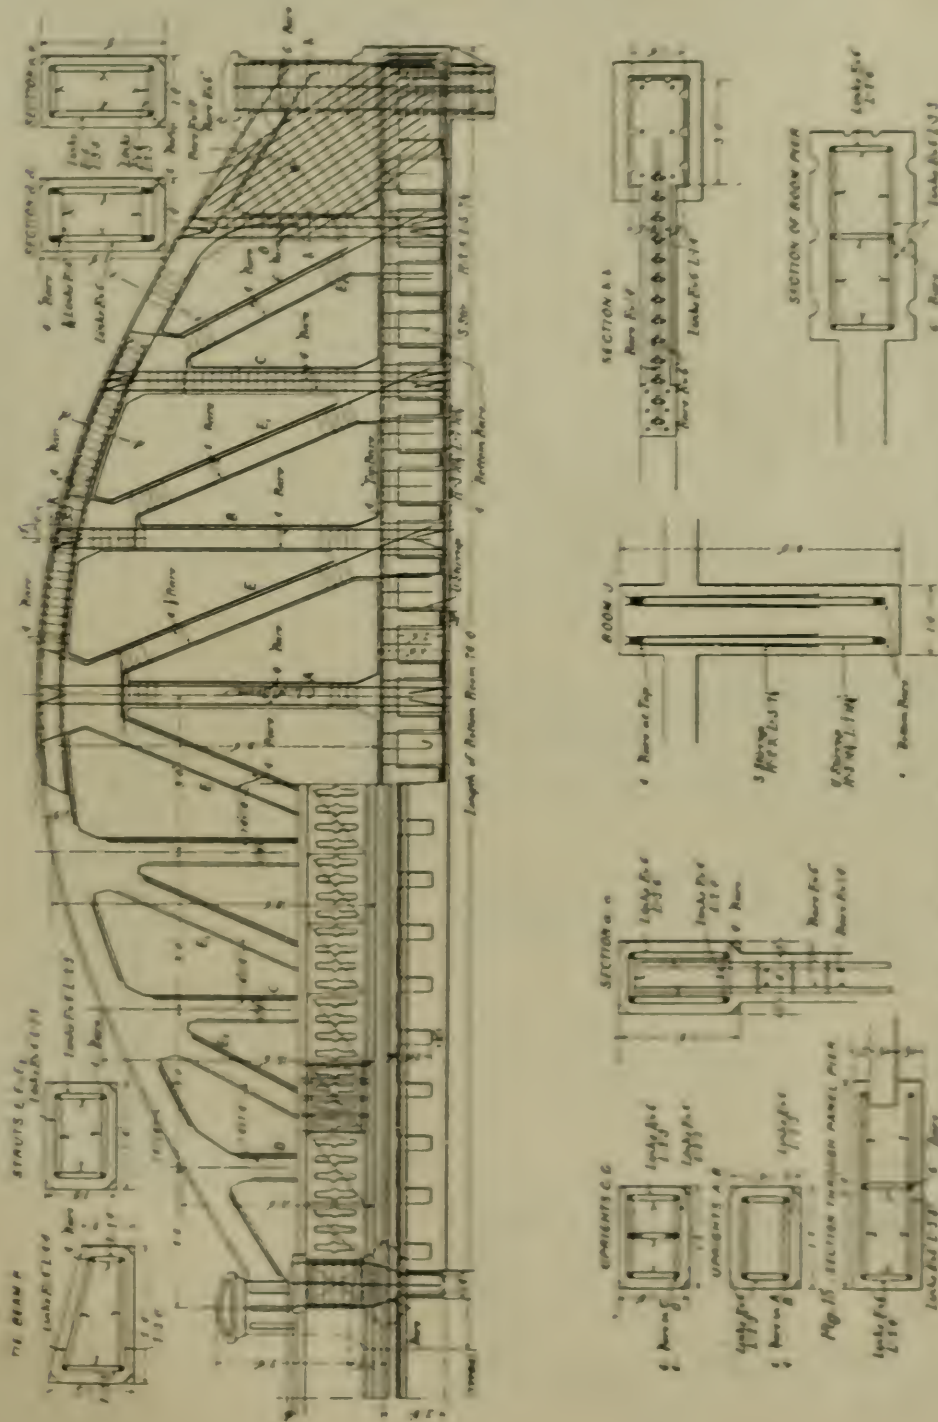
DETAILS OF DOVER AND DEAL RAILWAY BRIDGE.
